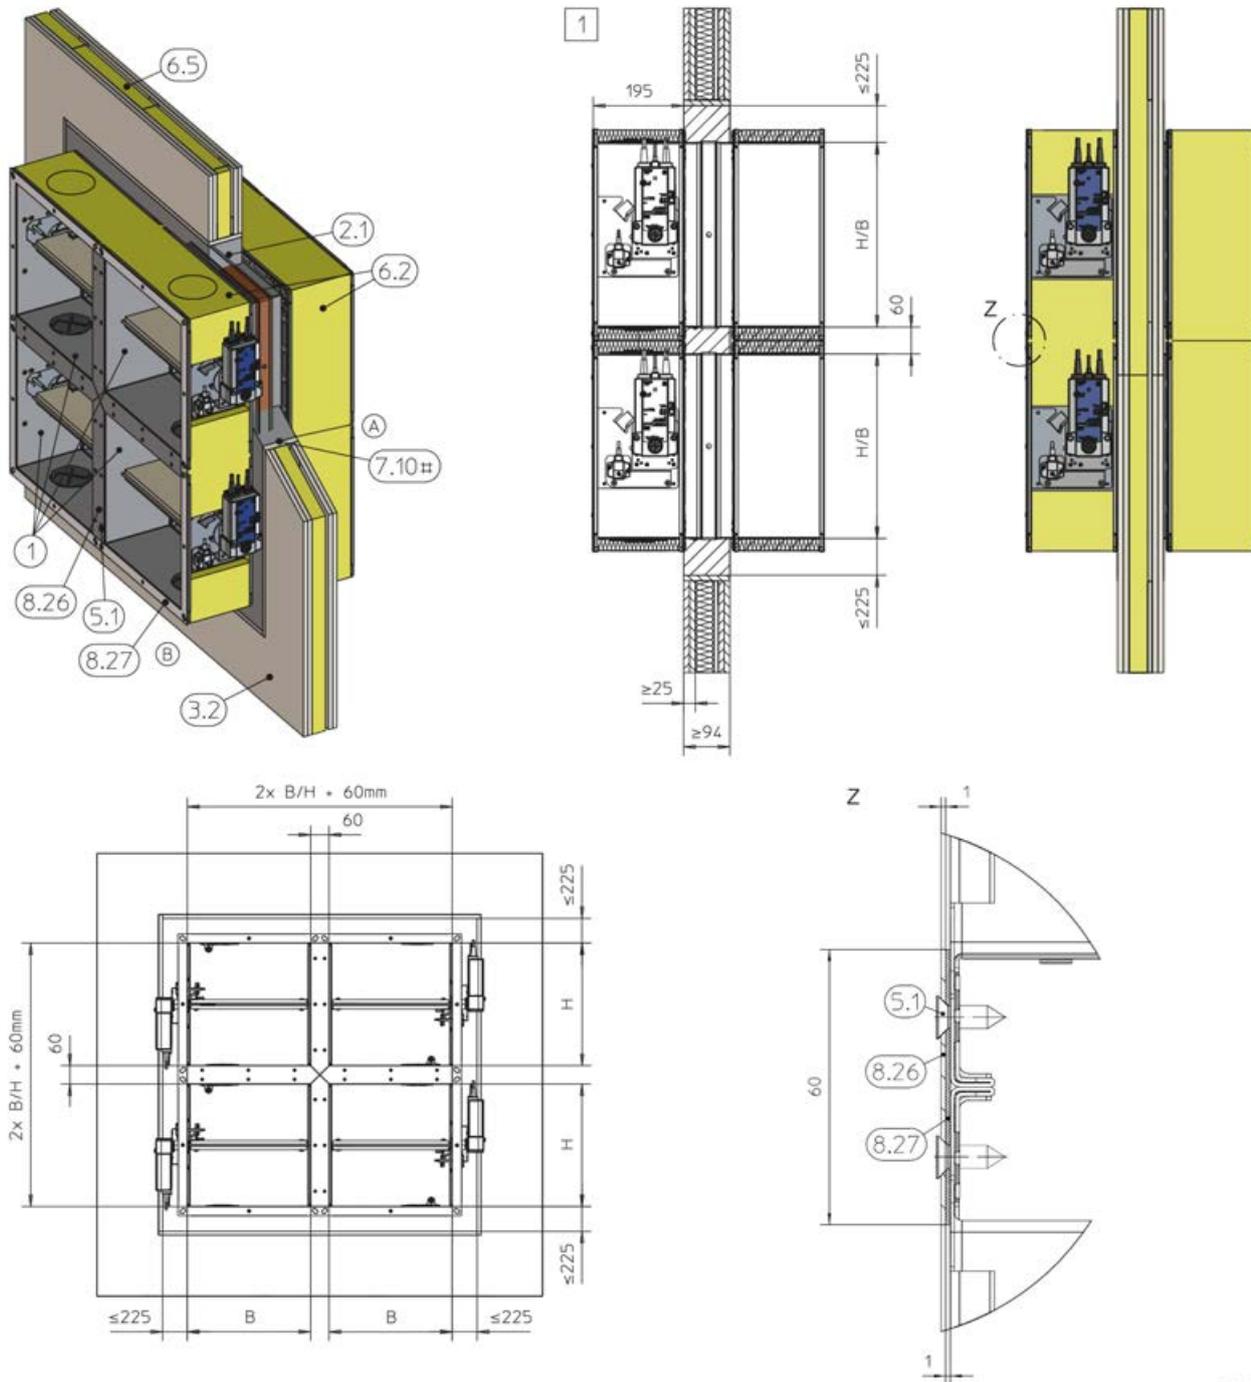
Mortar-based installation – multiple installation into one installation opening
